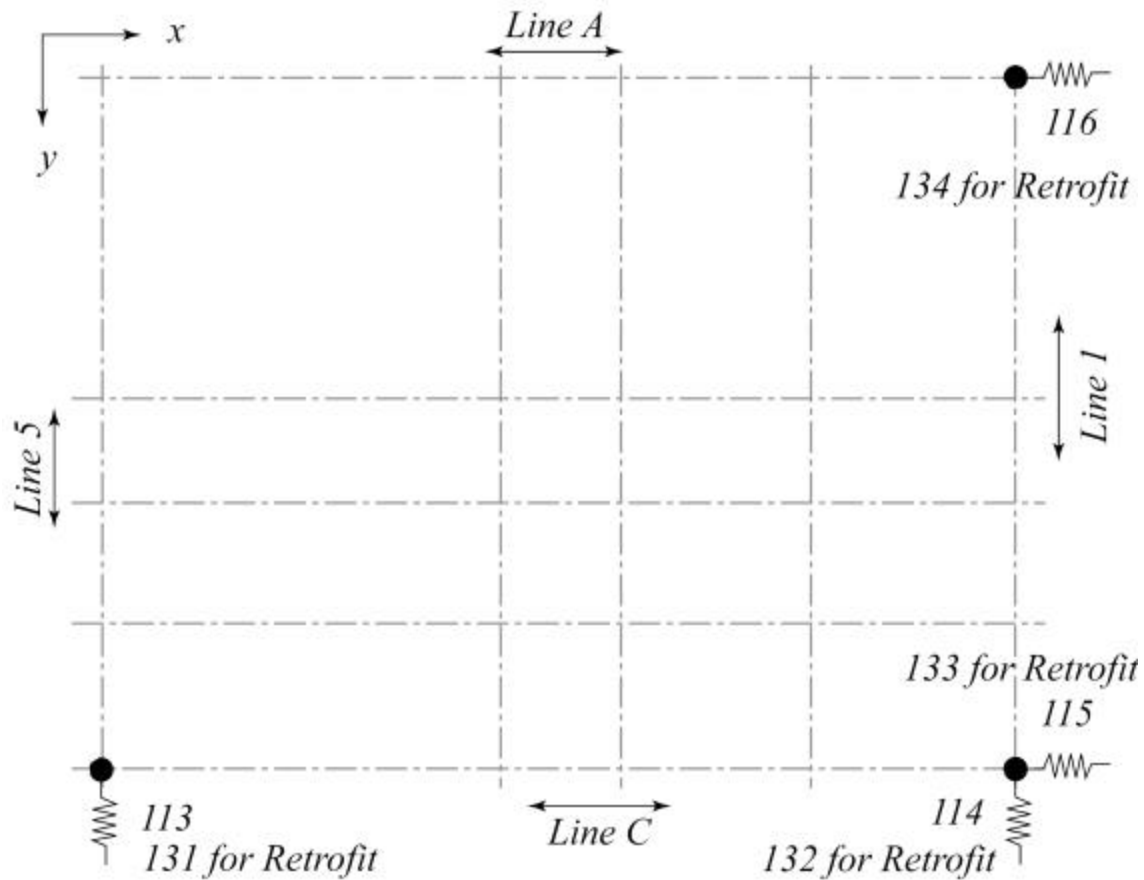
Location, Orientation and Numbering of the Shear Elements used to model the Retrofitted Cripple walls for the Small House Index Building.
